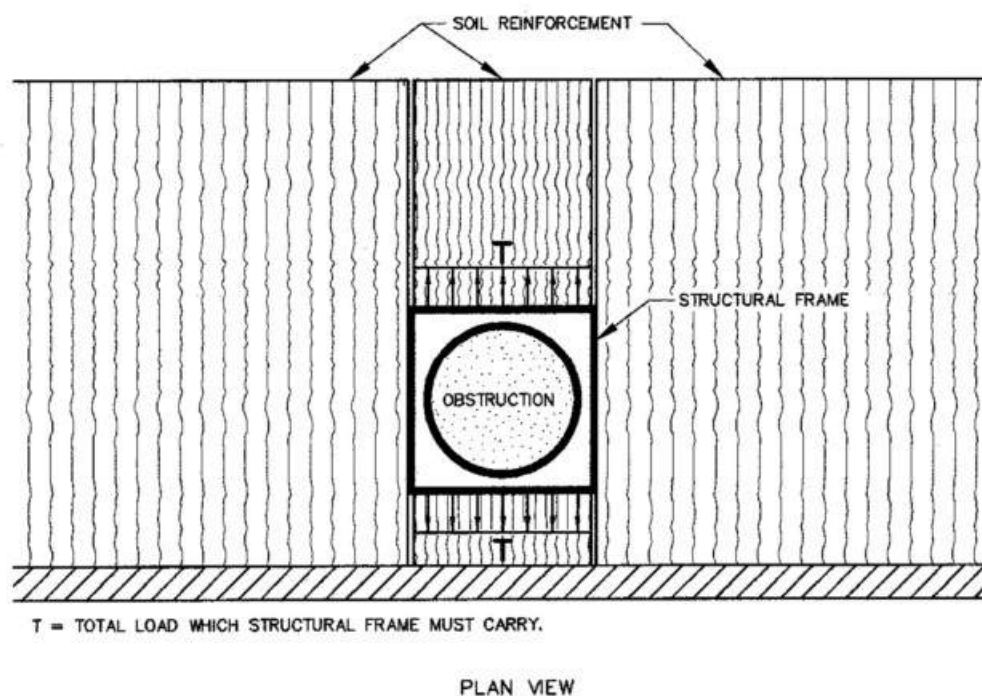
Structural Connection of Soil Reinforcement around Backfill Obstructions
